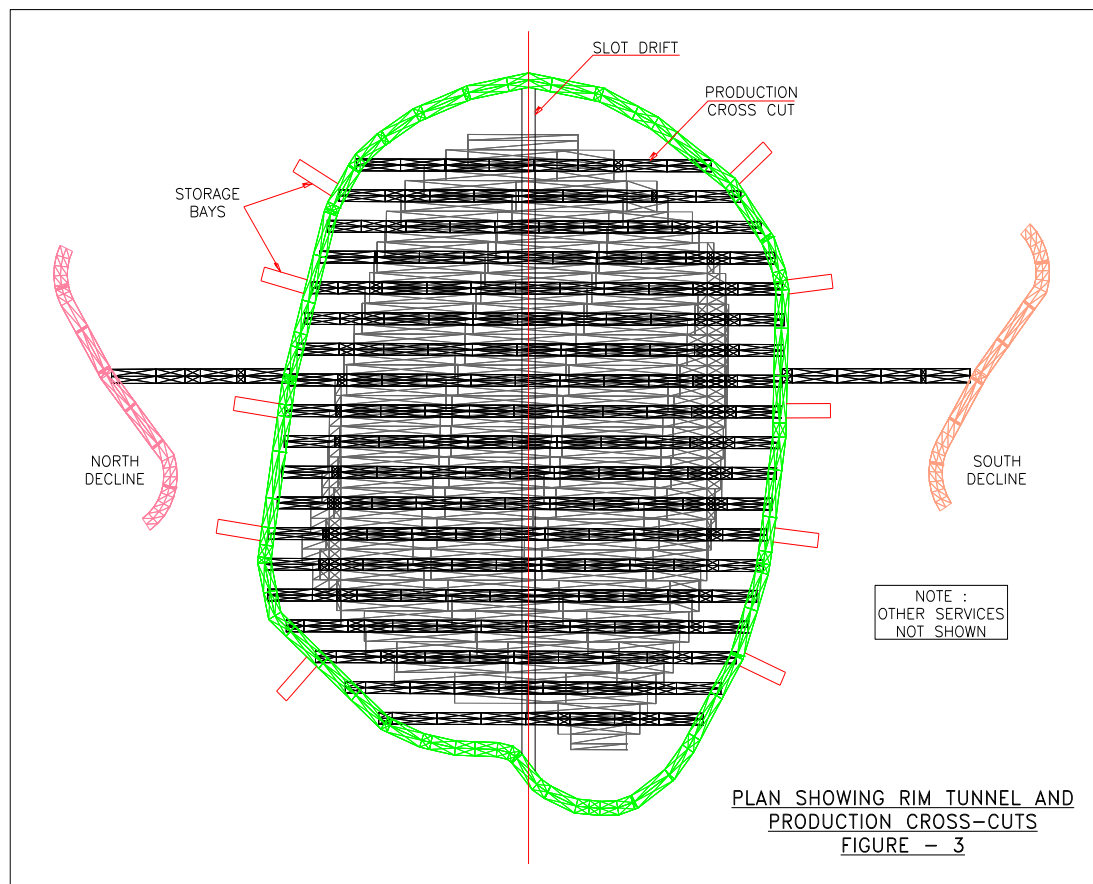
Schematic plan of a Sub-Level showing the rim tunnel and production cross cut
